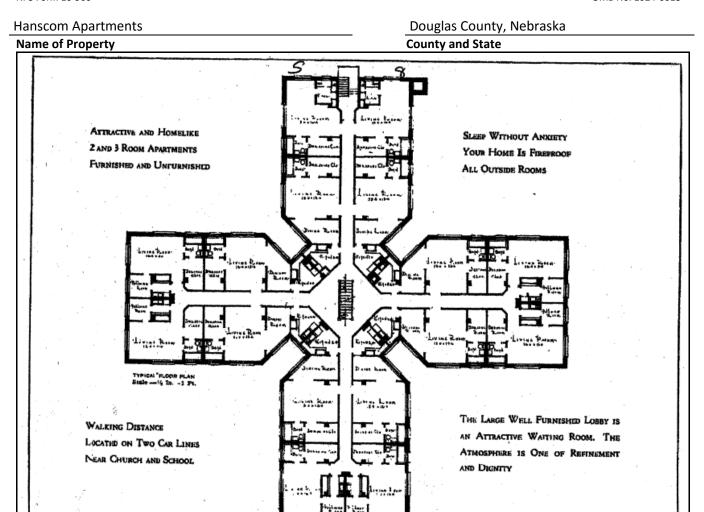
Plan of a typical floor of the Hanscom Apartments (the Park Avenue facade is located at the bottom of the figure) showing the building's unusual cruciform shape and the unusual shape of some rooms.
